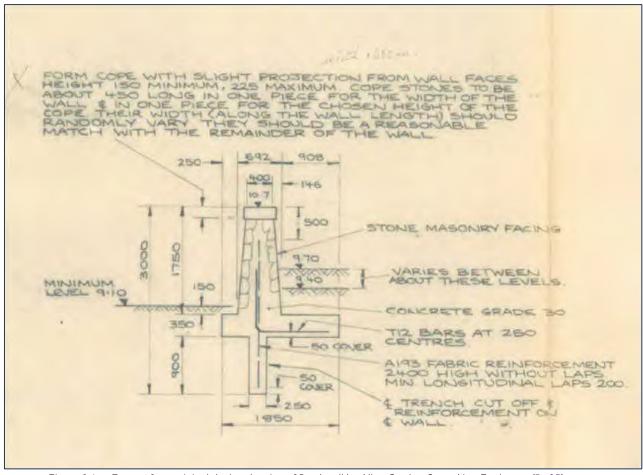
Excerpt from original design drawing of flood wall by Allen Gordon Consulting Engineers (5 of 5)
